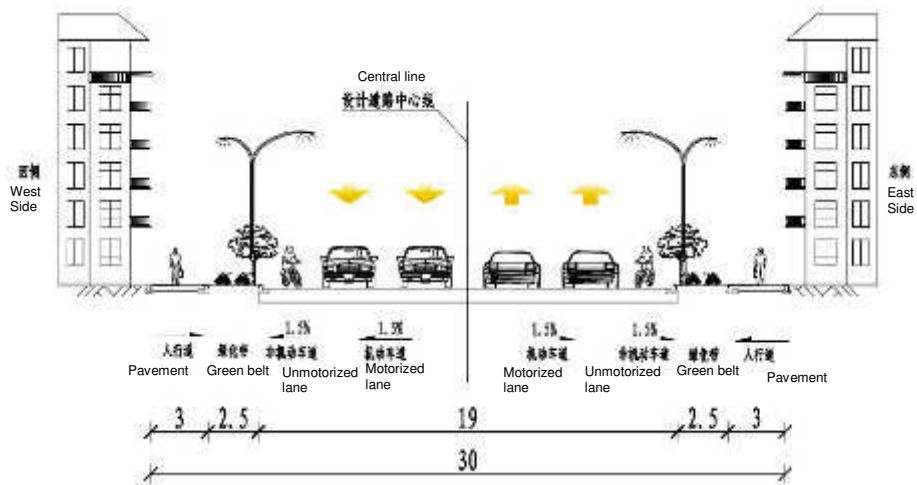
Proposed road layout for the China-Russia Business Park (SY)
